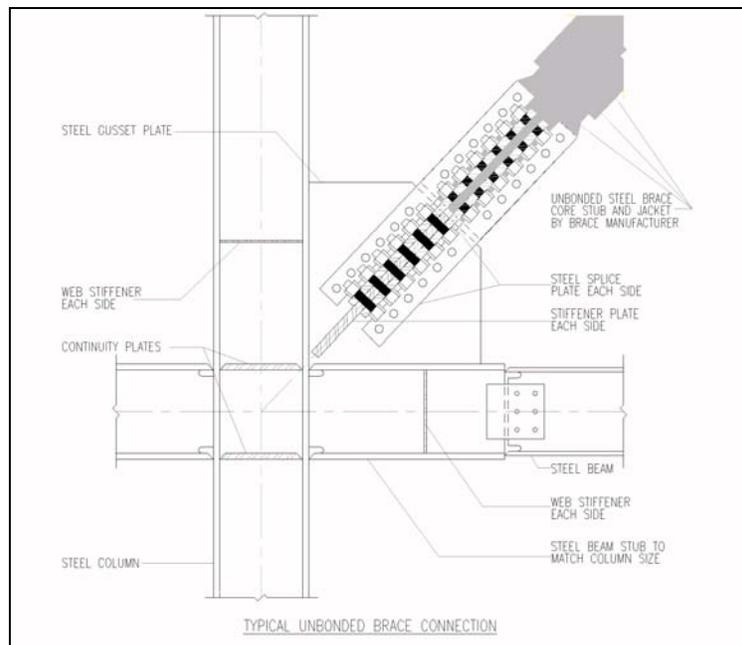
Typical Detail for Unbonded Braced Frame Connection.
